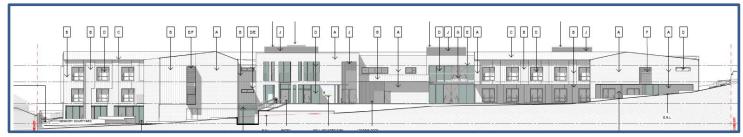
Northern building elevation (internal within the site, no landscape shown)
